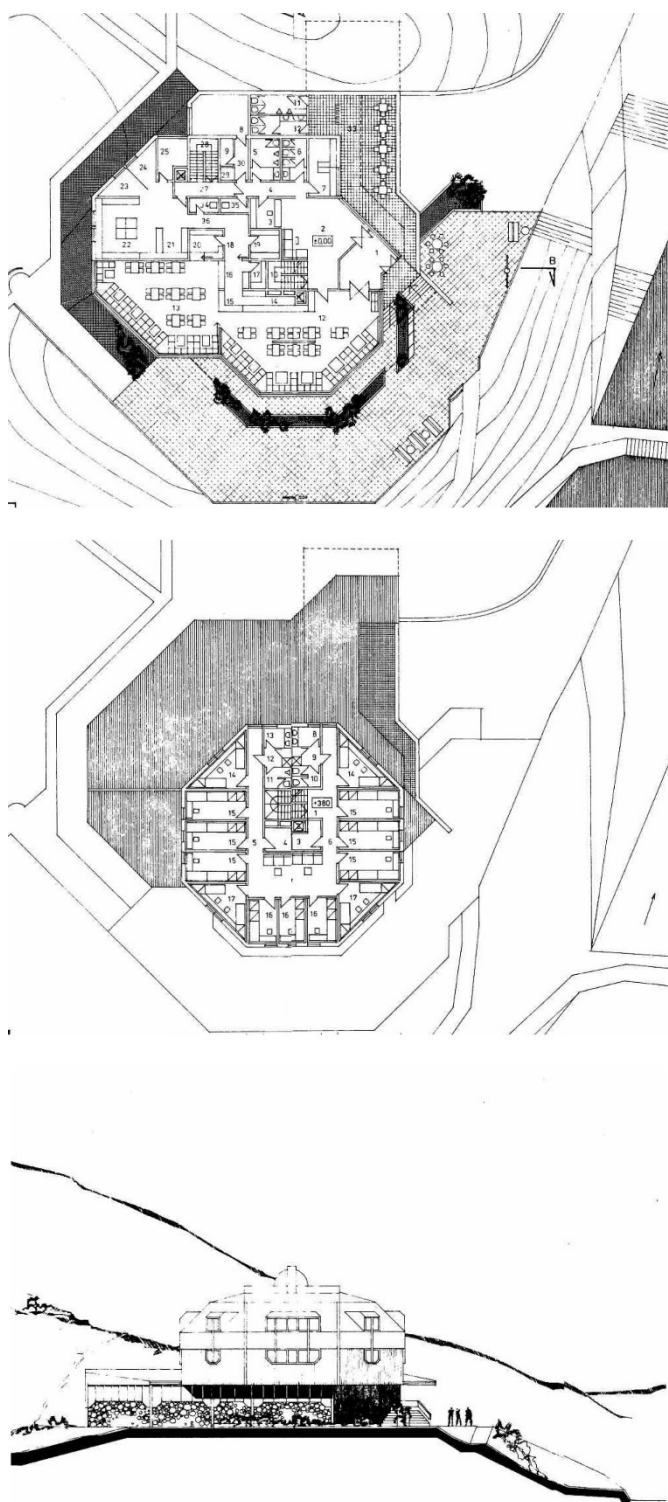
Chata pri Zelenom plese proposal, 1985. Authors: Ludovít Jendreják, Ján Šilinger and Olga Babjaková, ŠPTÚ Bratislava. Top to bottom: plan of the first floor, plan of the second floor, west elevation. (Source: Legutky, 1985)
